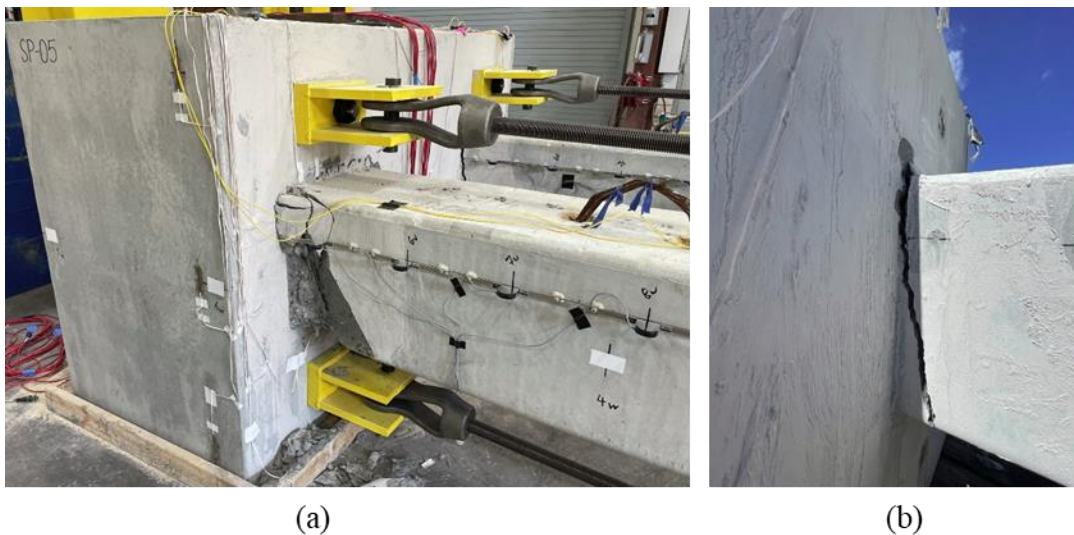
SP-05 failure mechanism (a) spalling of concrete on pile (b) pile-to-cap connection failure in the east pile
